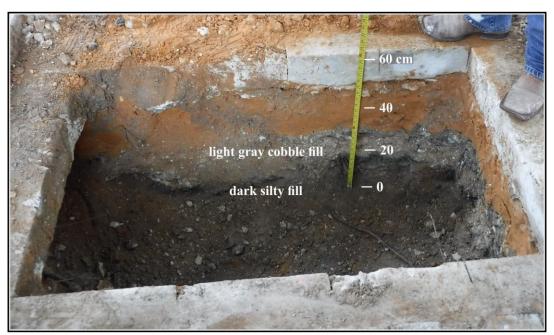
Area excavated for Kiosk 1 foundation (view west).
